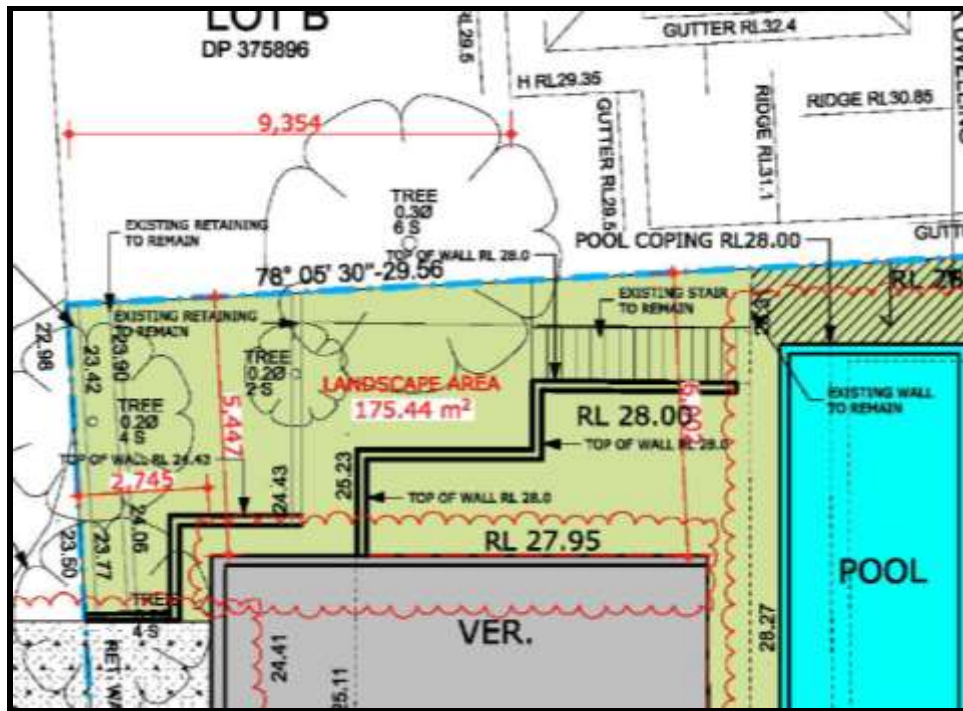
Approved site plan - DA 2020/0145 (Source: Council file)
